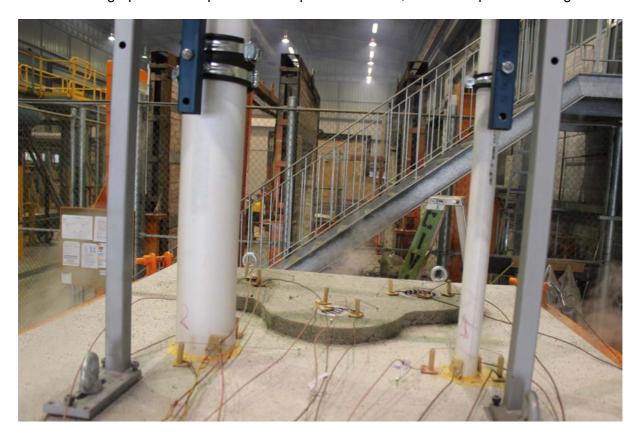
Unexposed face of penetrations #1 and #2 prior to testing
